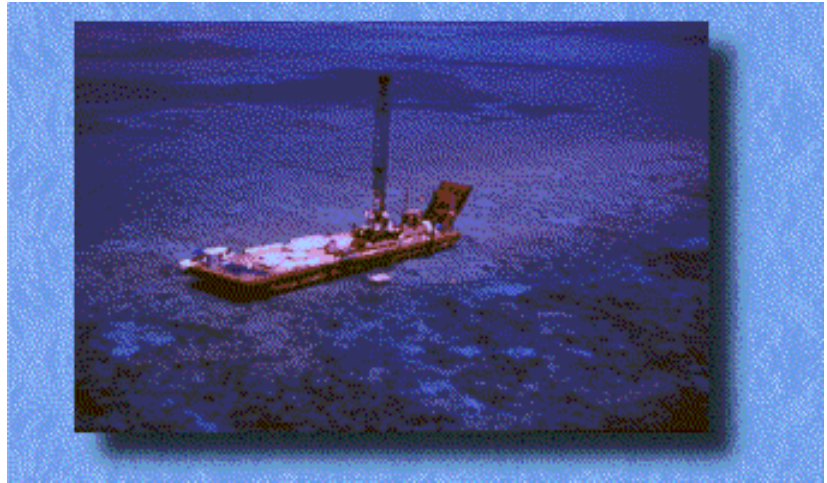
A work barge replaces damaged sections of coral reef with specially constructed replacement sections.
